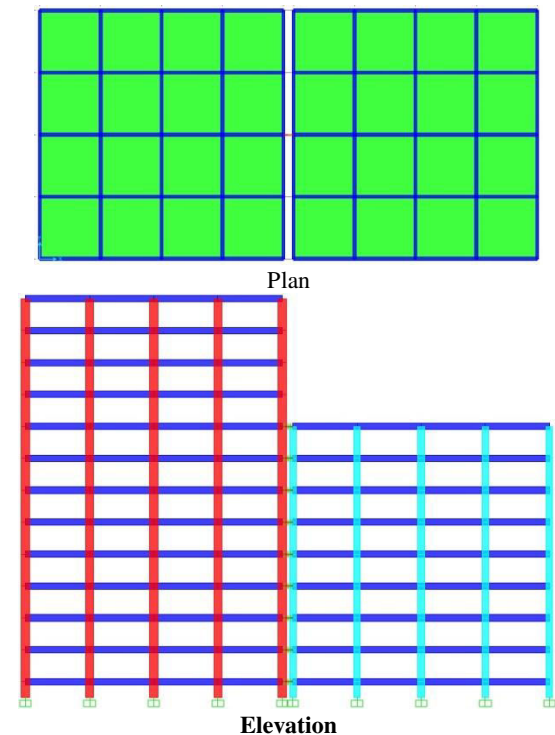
Plan and elevation of buildings considered for slab to slab pounding
